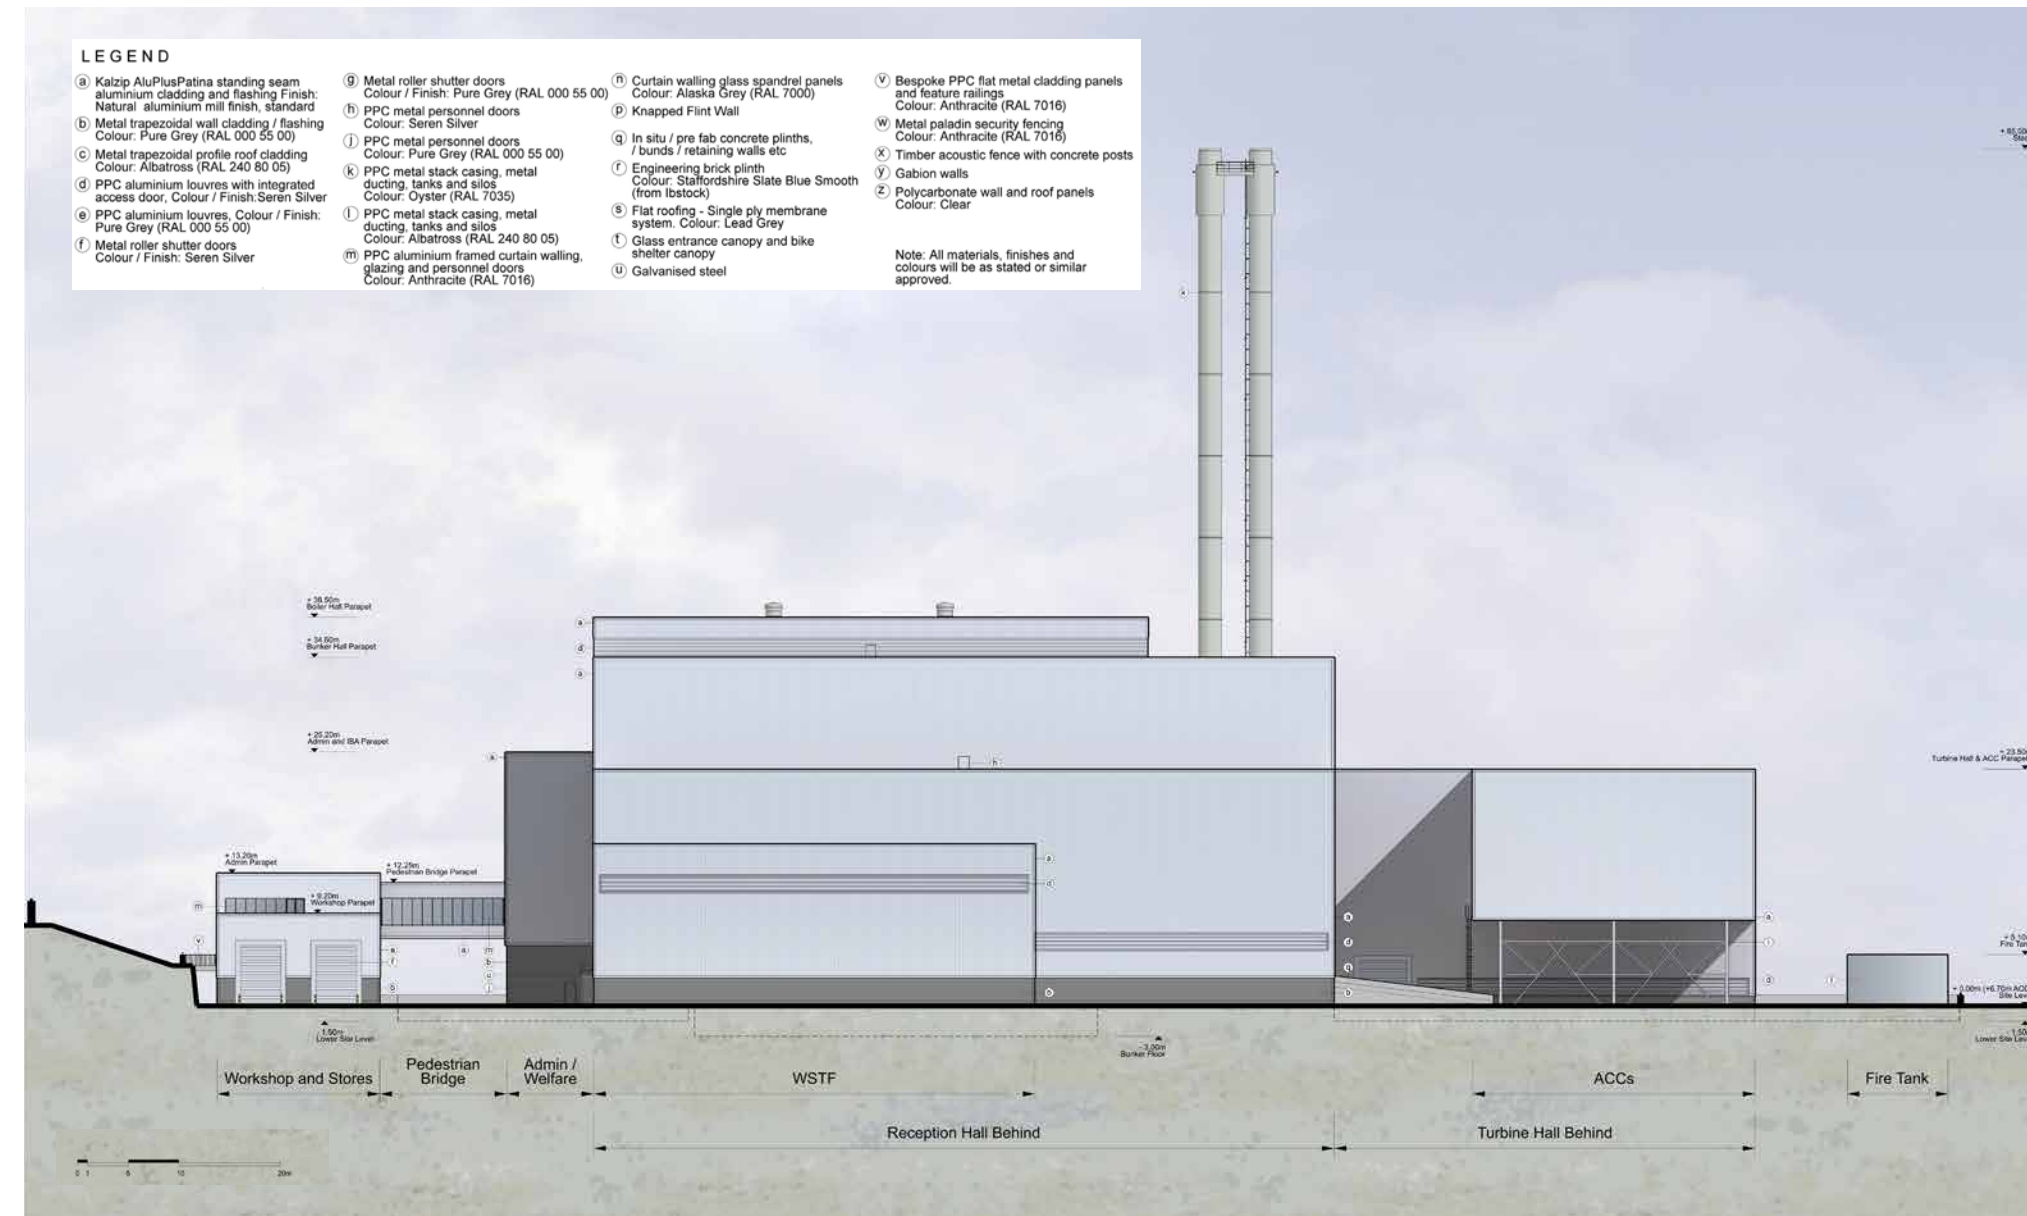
Proposed ERF south elevation – extract from drg PL302
